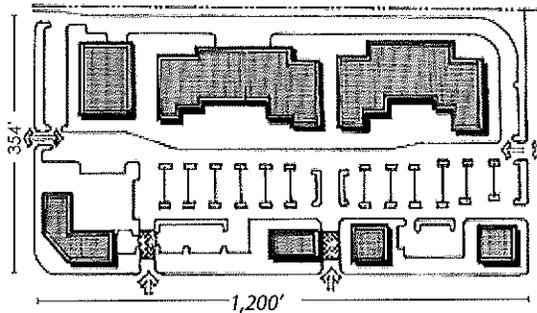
This site plan example depicts an approximate 10 acre site with 42% freestanding "pad" building frontage
